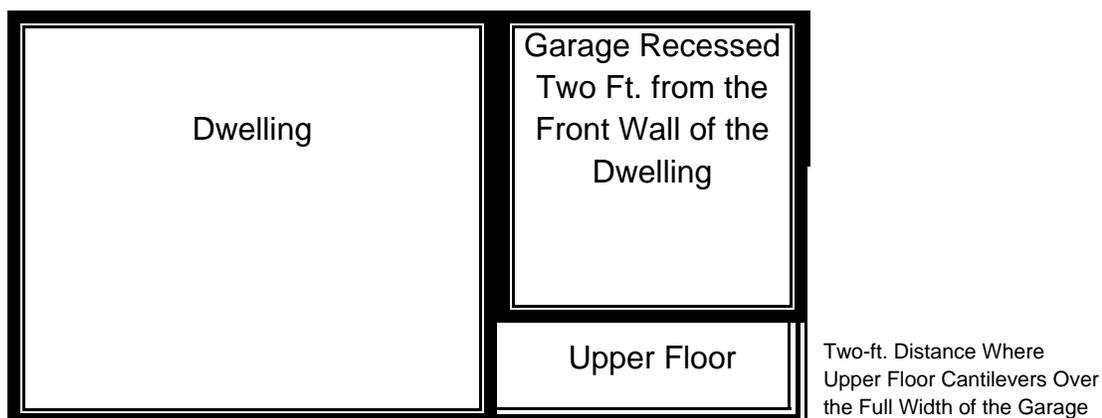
Garage Recessed and Upper Floor Cantilevers Over It
